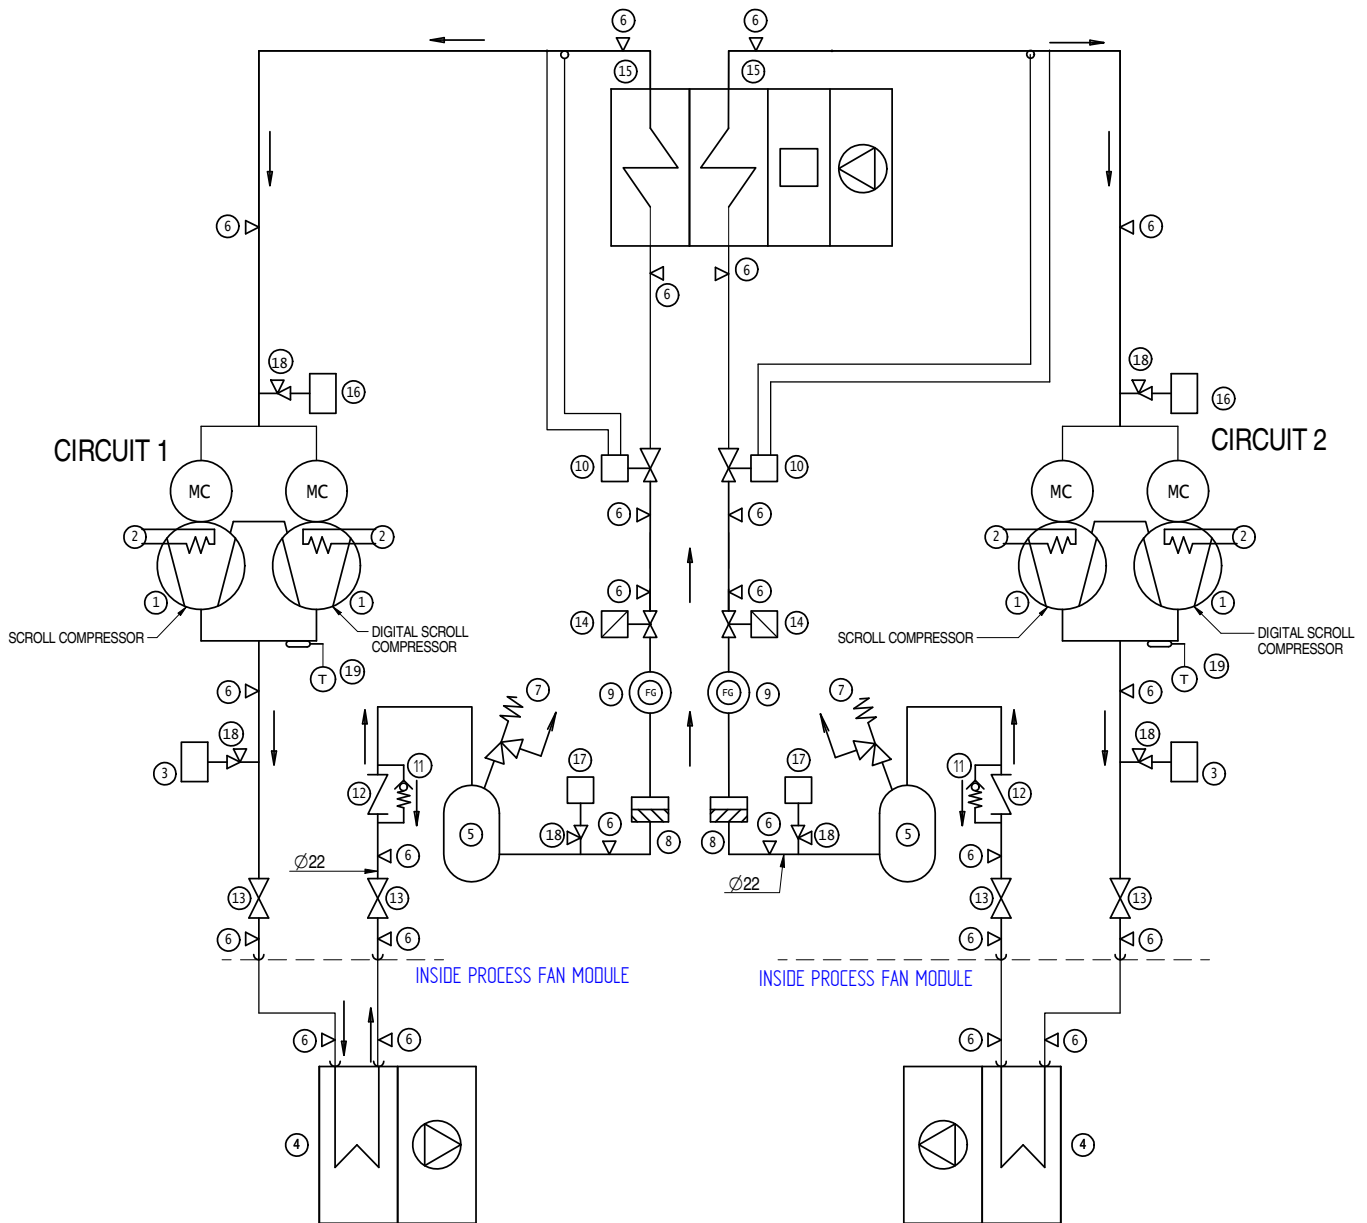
DX system refrigerant circuit - Tandem DIGITAL SCROLL compressor - TXV
